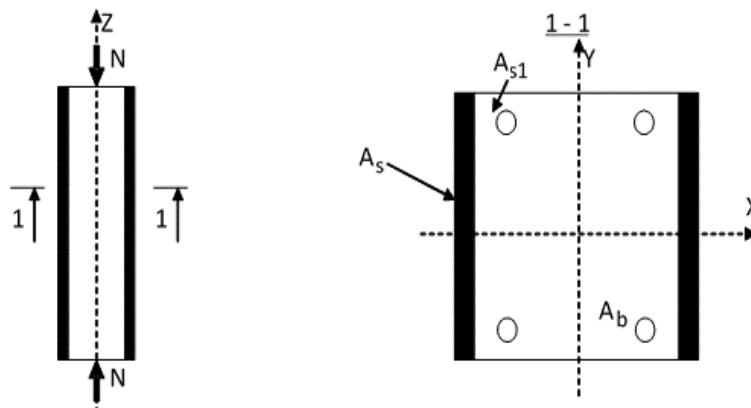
Design diagram of a compressed reinforced concrete element reinforced with an adhesive joint
